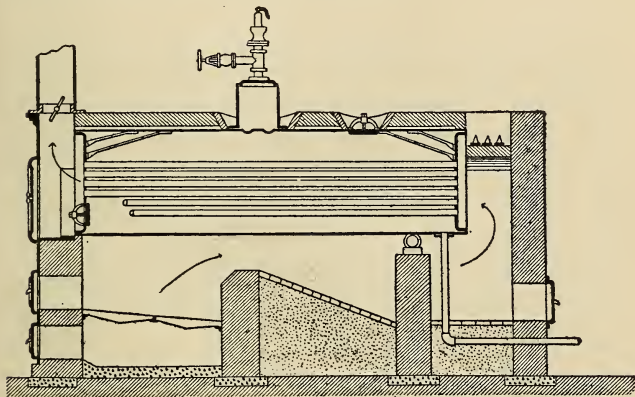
Horizontal return tubular boiler and setting; this type of boiler is suitable for low and moderate steam pressures.
